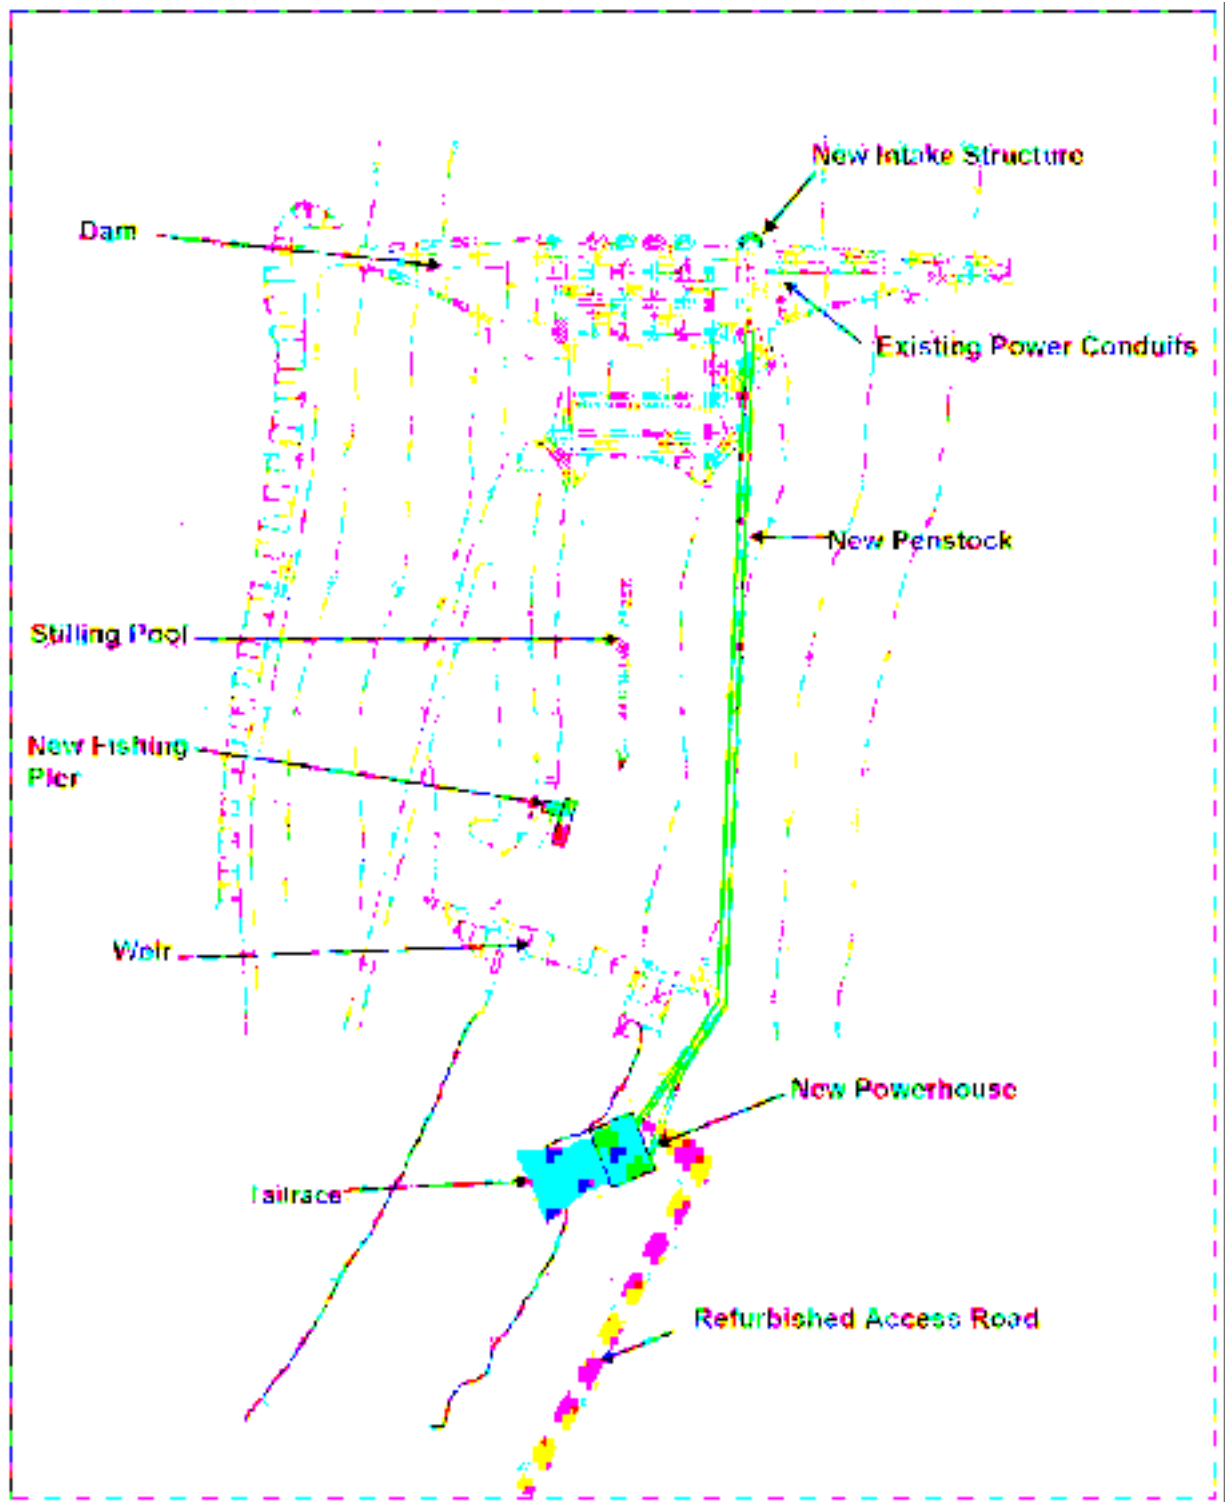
Mahoning Creek Project Site Plan (Source: license application, as modified by staff).
